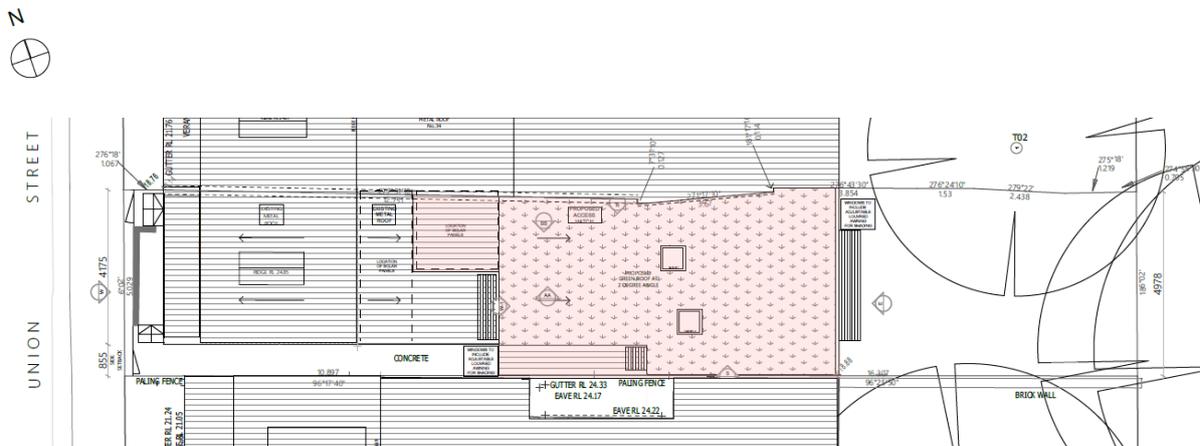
Proposed Roof Plan (extent of new works outlined in red)
